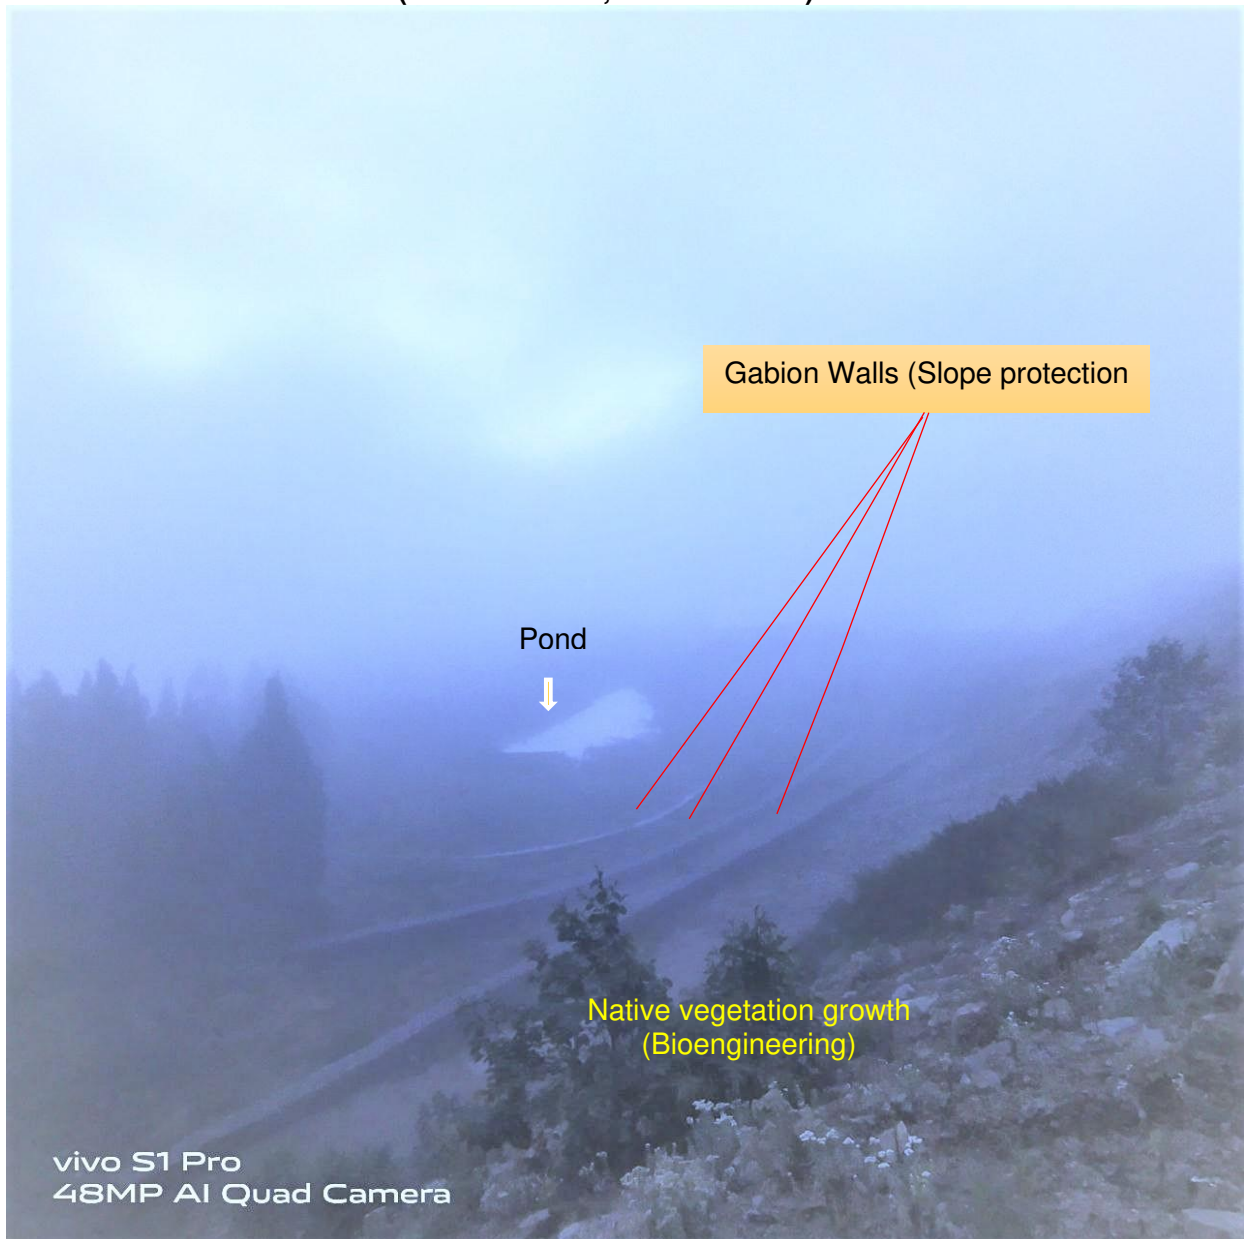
Gabion wall construction for slope protection at YDA (Source: QPR, March 2021)
